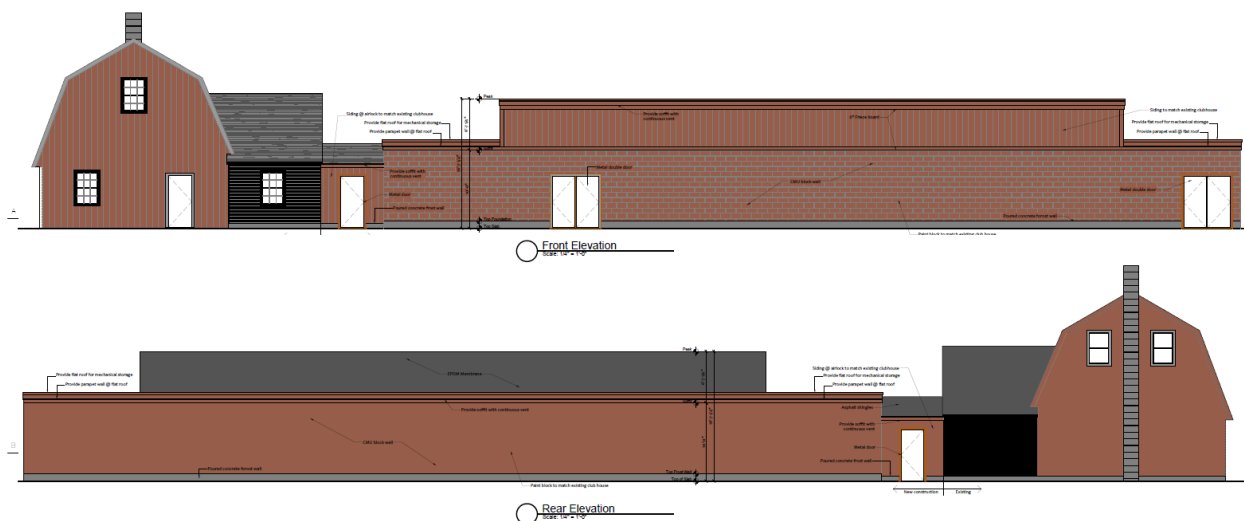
Image of the color architectural elevations for the proposed new shooting range and existing club house at 19 Ferry Brook Road.
